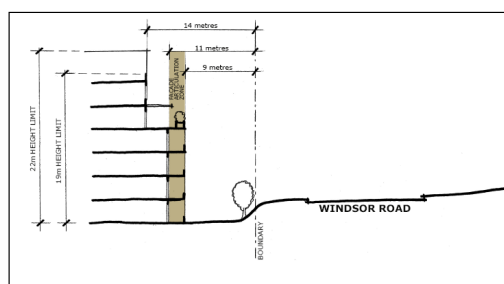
Rembrandt Drive & Windsor Road Facade Articulation Zone
